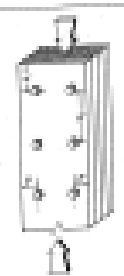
B: Typical Nailing Schedules for Built-up Columns.
